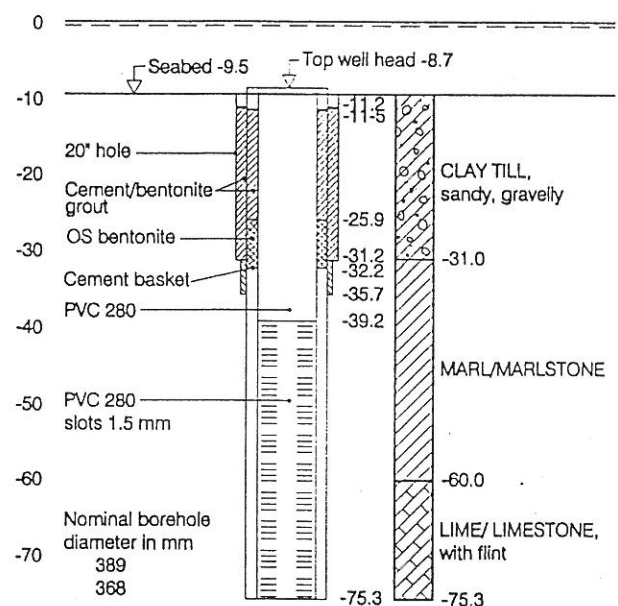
Schematic cross section of typical marl well installation (levels and depths are metres)
